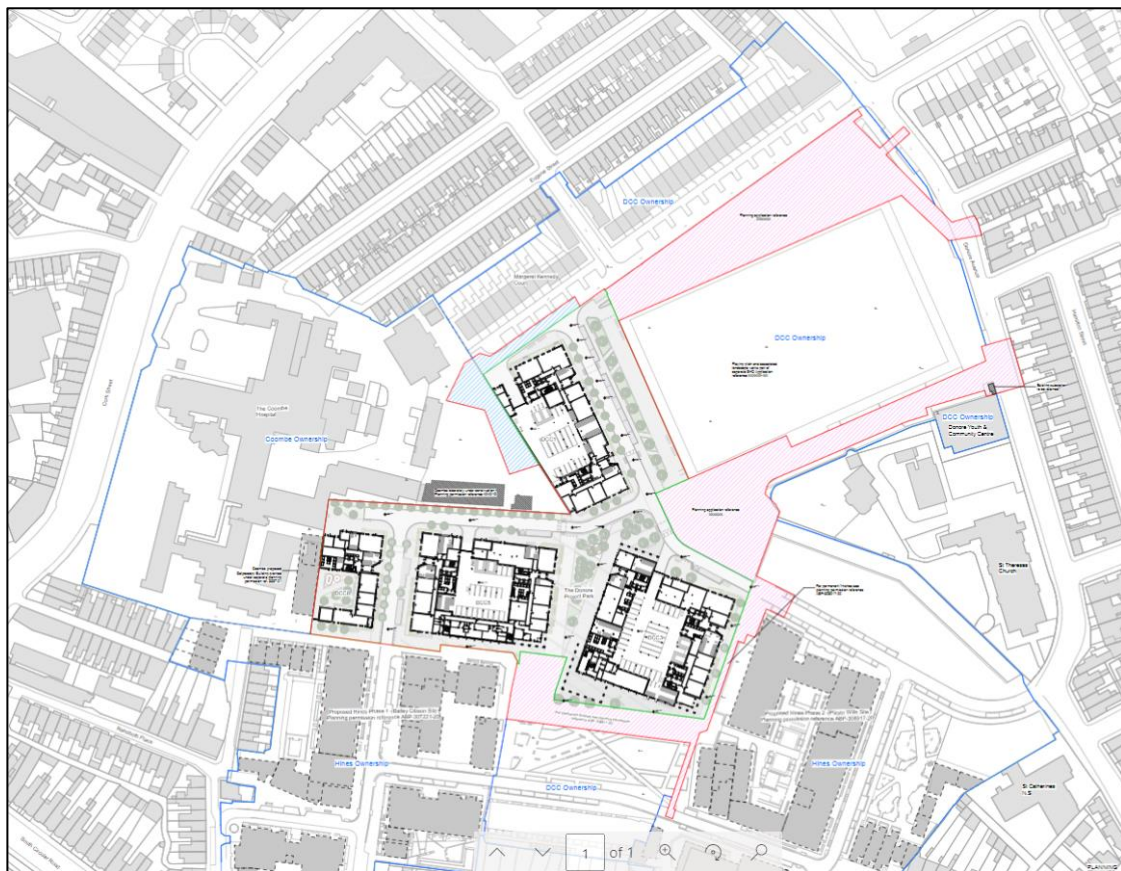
Proposed St. Teresa's Gardens Development and site location
